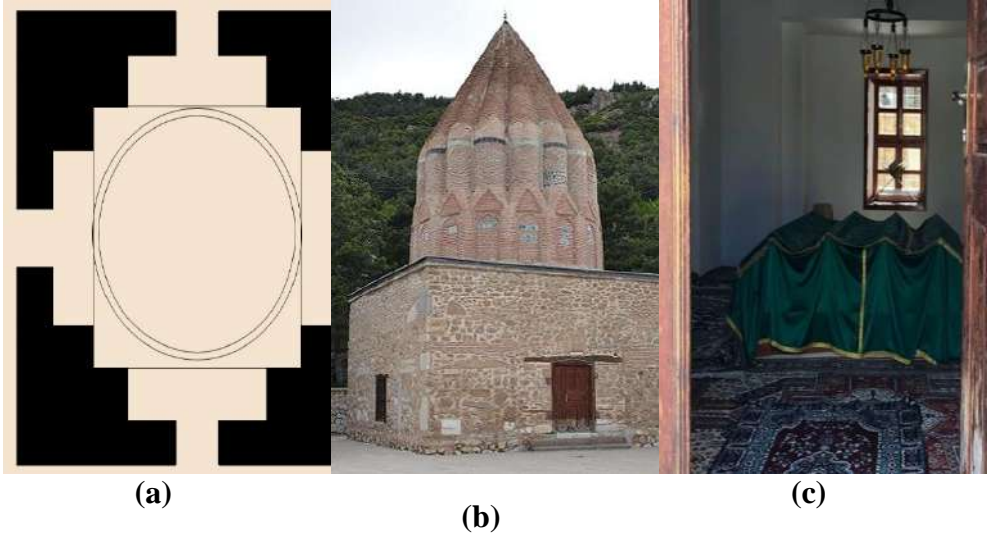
Buildings reflecting the urban characteristic of Akşehir (a-Seyyid Mahmut Hayrani's Tomb Plan b-Tomb's Facade c- Tomb's Interior (illustration: authors).
